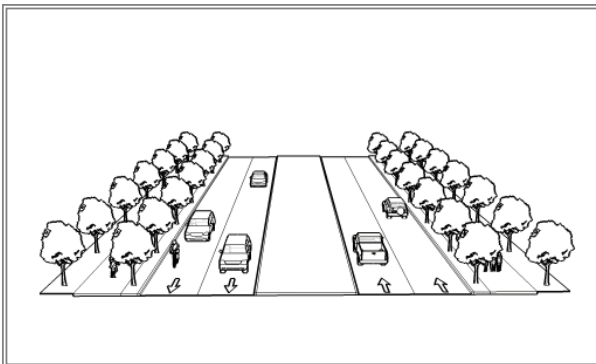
Recommended design – trees adjacent to travel lanes and outside of ROW/Back of sidewalk
